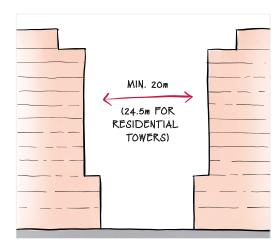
Provide separation distance between towers on the same site of 20 m for commercial buildings and 24.5 m for residential buildings (7.1.7. a).
